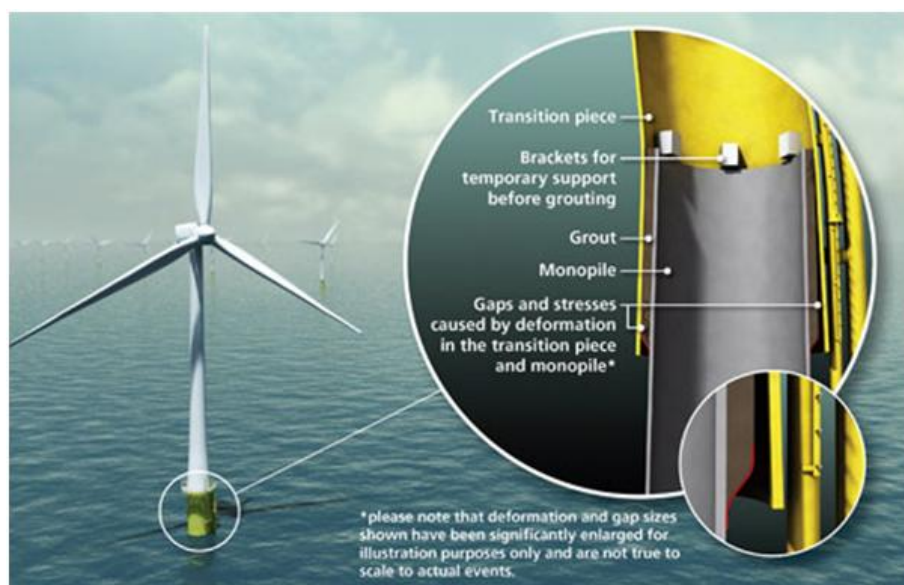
Transition piece connection with temporary supports and straight grouted section
